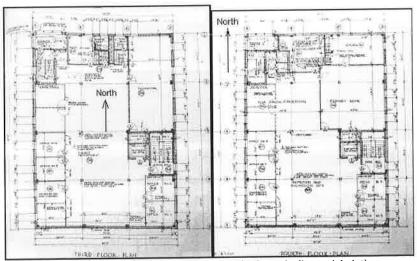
Third floor plan (left), fourth floor (right) (Gerald Griffith, architect, July 1956, in the possession of the building owner)
